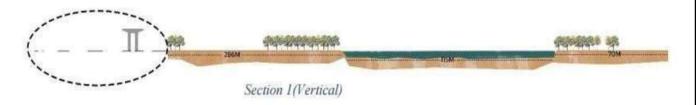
ROAD SECTION OF THE ROAD INFRONT OF SITE
